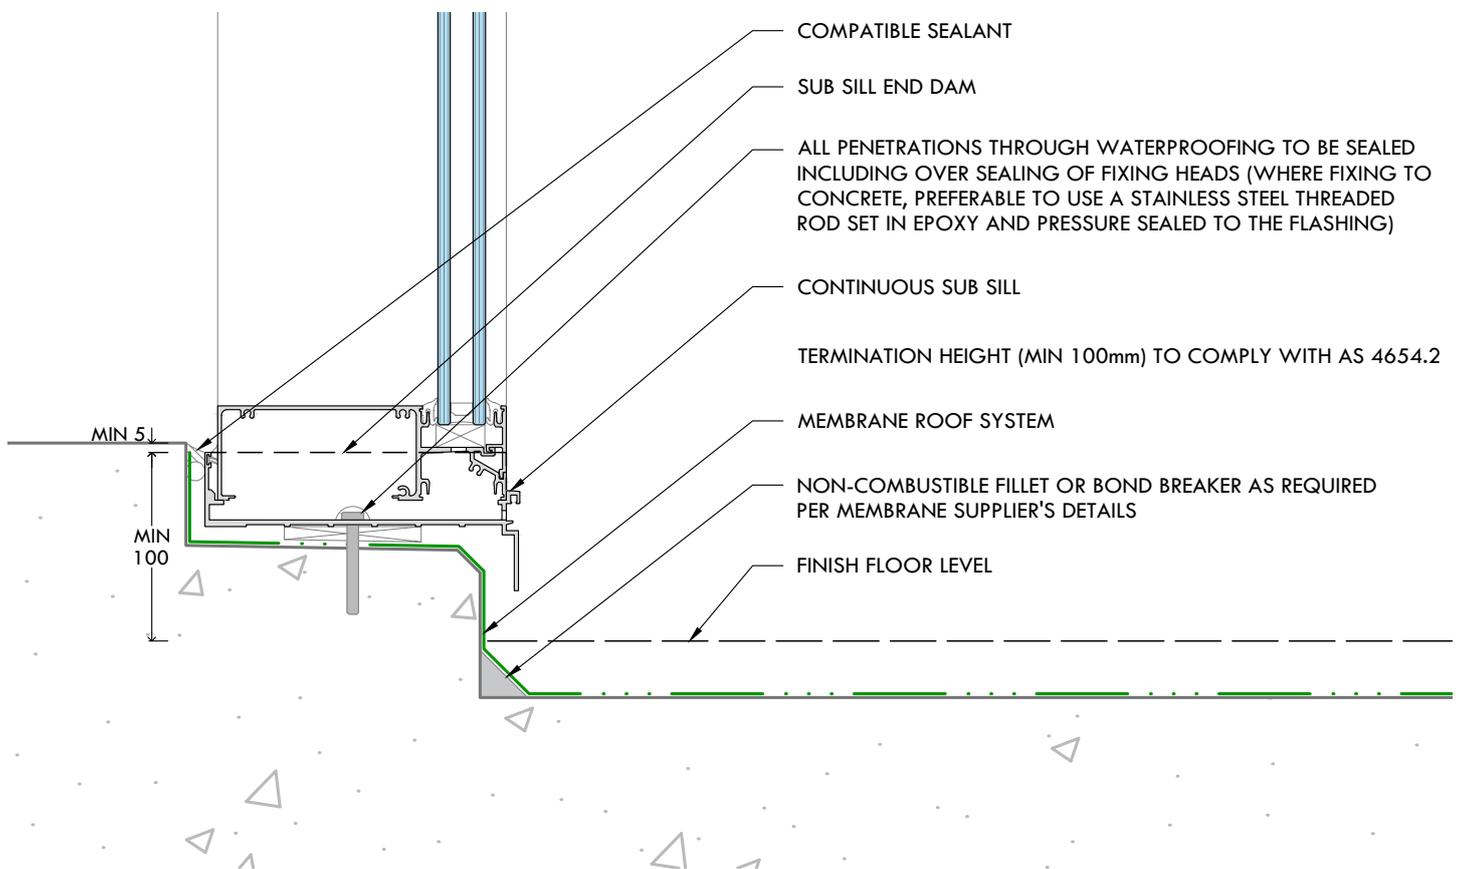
MEMBRANE ROOF TERMINATION AT WINDOW SILL
